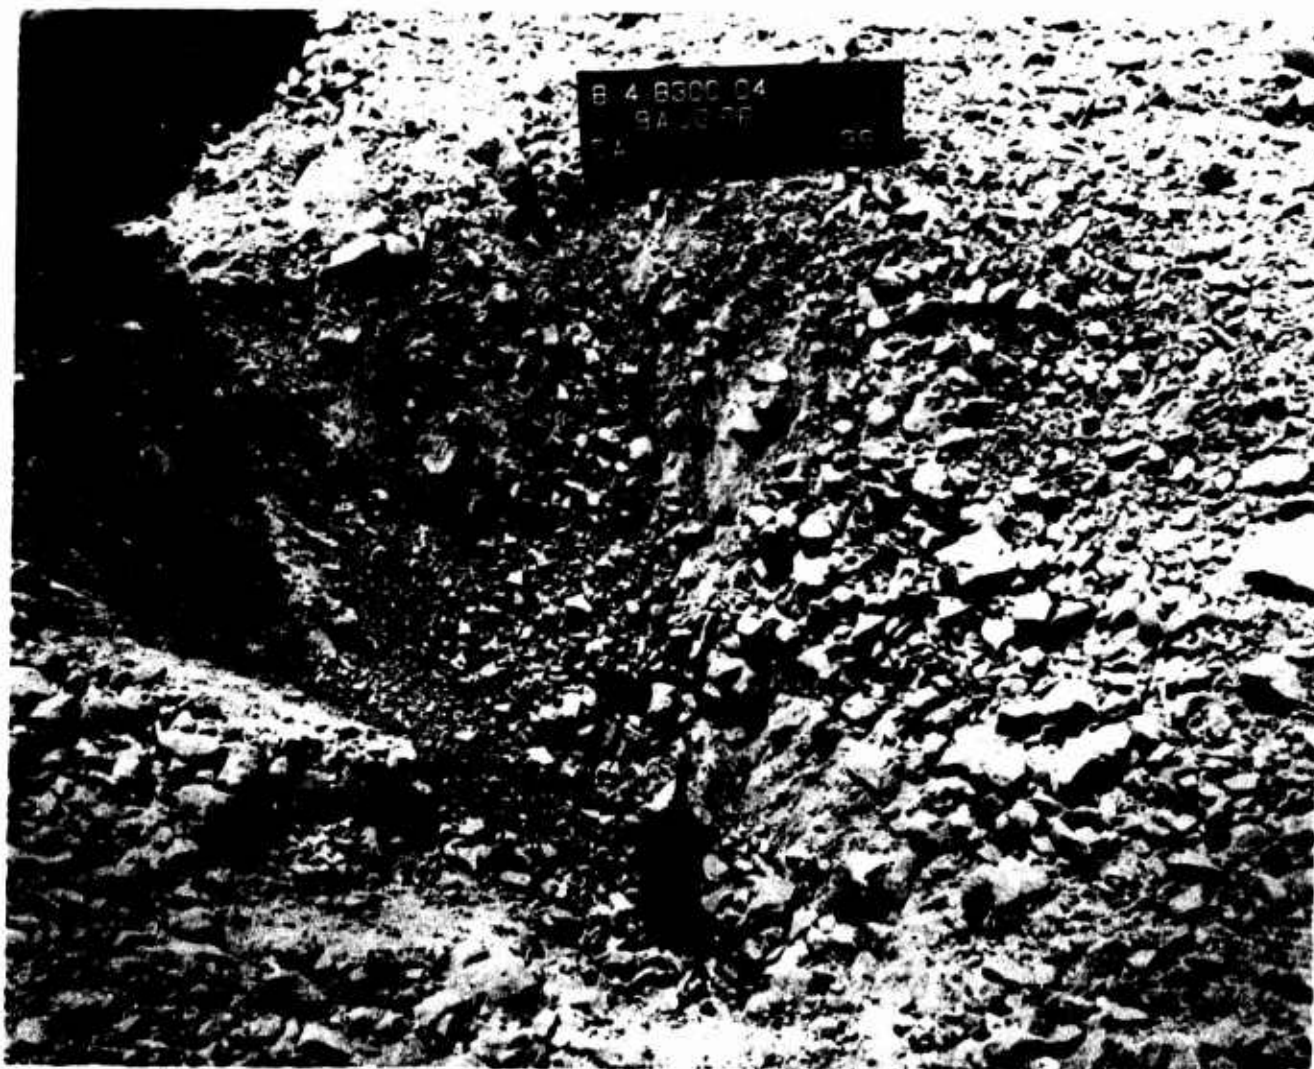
Shaped charge placed at base of original excavation to form a second pilot hole.
